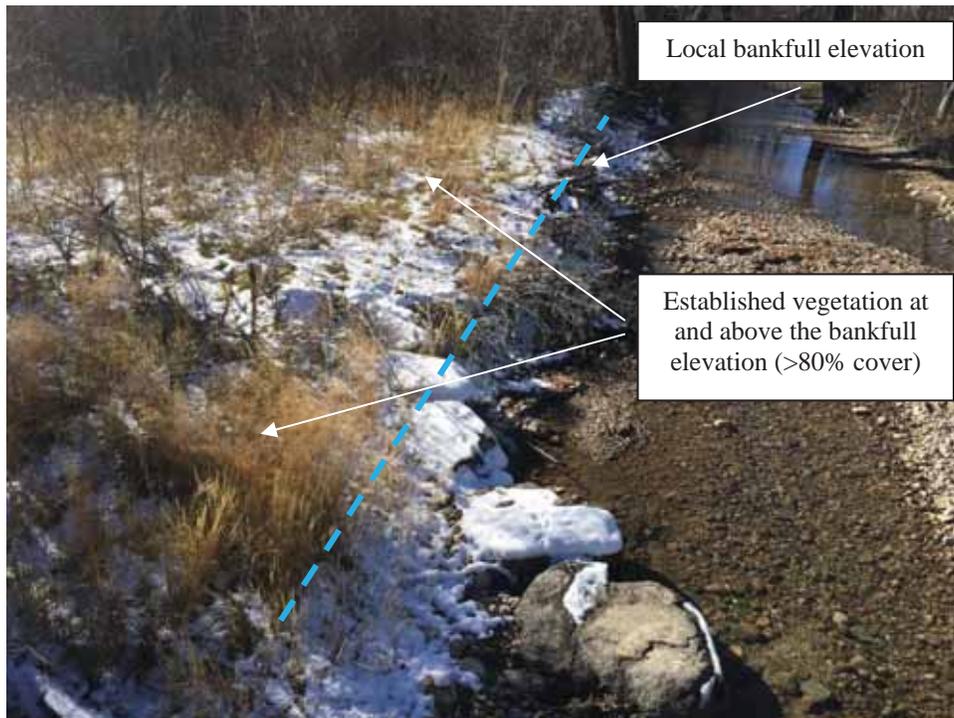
Photograph looking downstream at cross vane #3 bank key (Station 3,020 ft), Badger Creek N3000W project reach.
